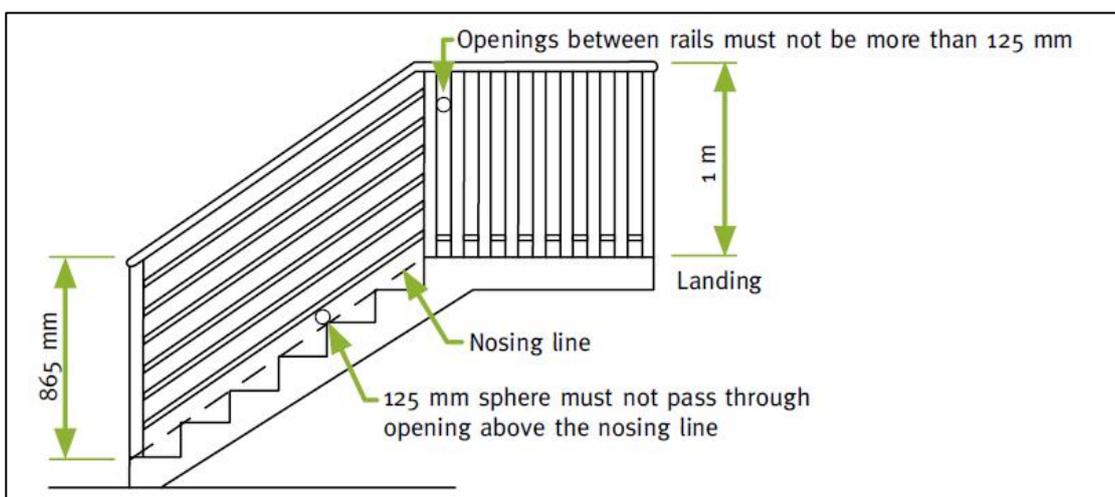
Balustrade or other barrier construction (Courtesy: Australian Building Codes Board).
